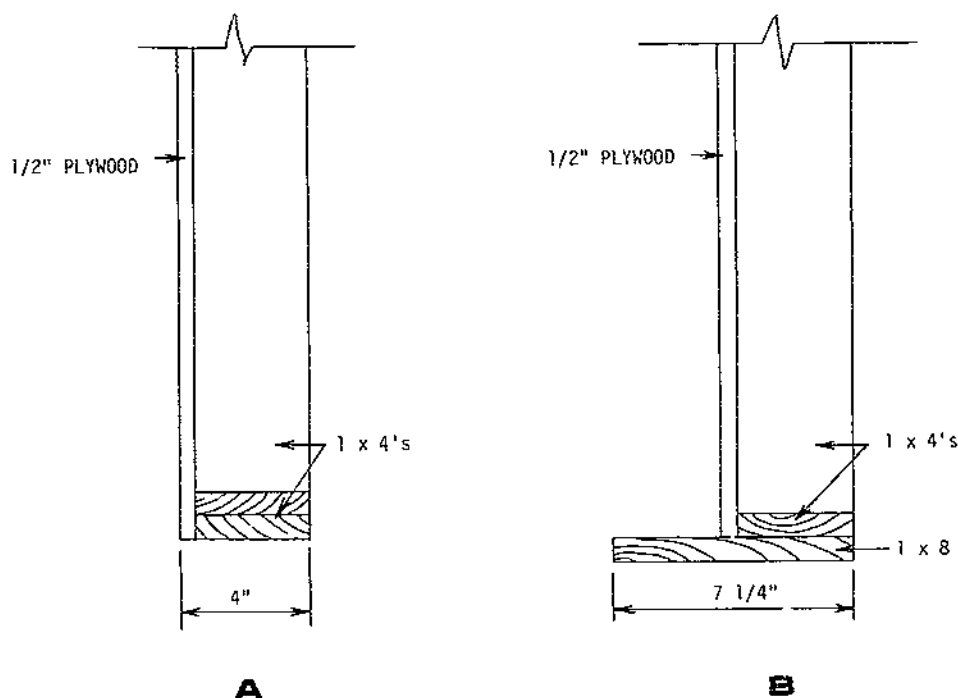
Modification of foundation panel to form a wide footing. *A*, Original foundation panel. *B*, Foundation panel with wide footing.
